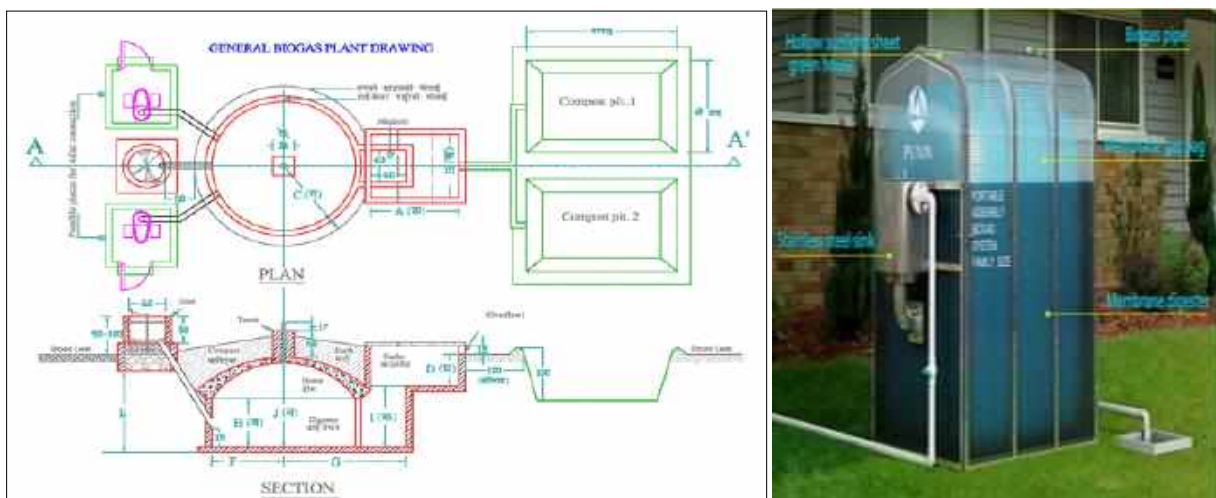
(left) Plan and cross section in rural biogas plant with 2 slurry tanks and 2 attached bathrooms (right) Prefabricated biogas plant receiving black wastewater and installed in house's front yard
